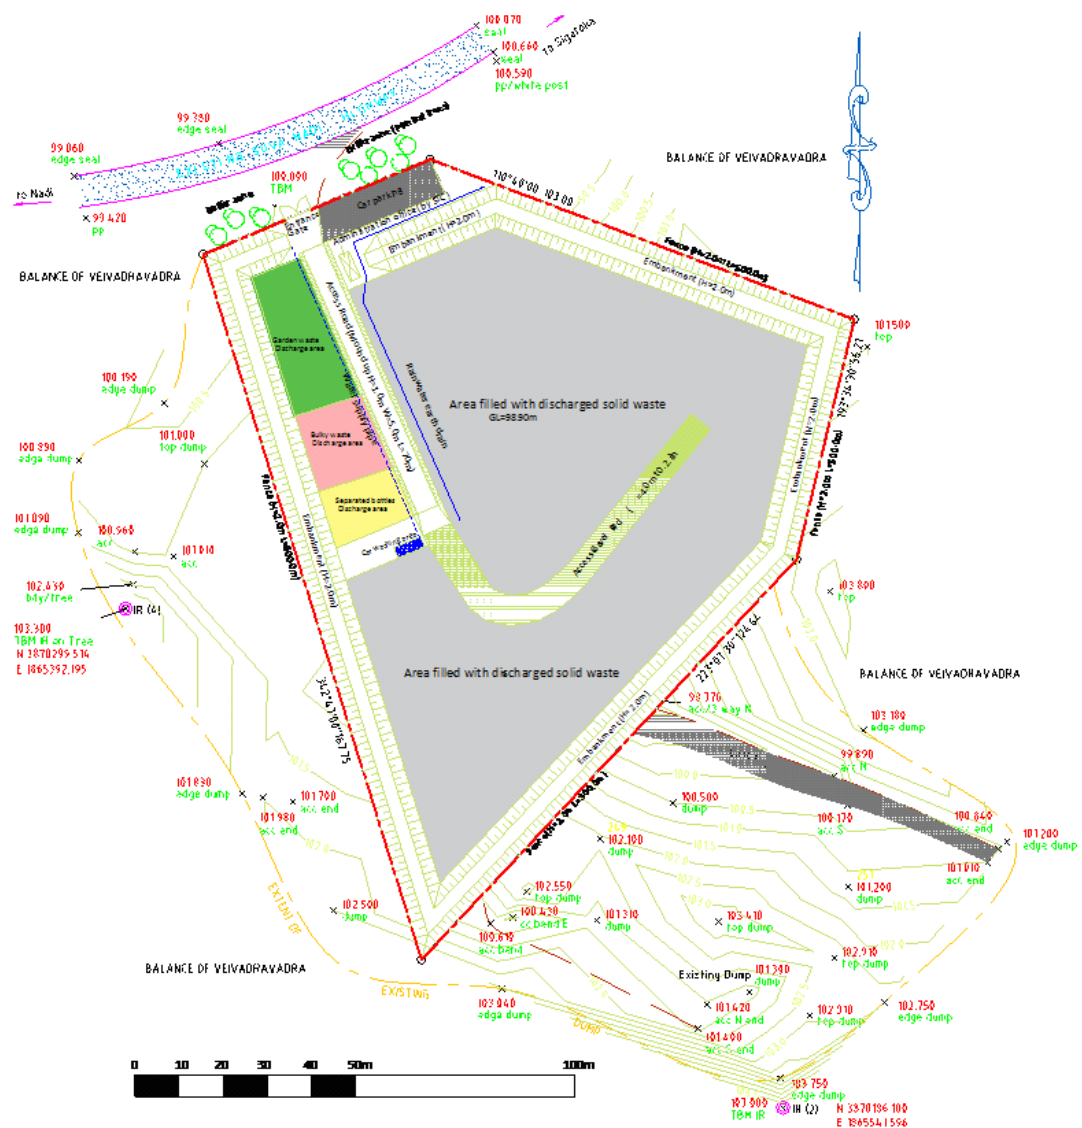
Layout of rehabilitated landfill site at Sigatoka Town
